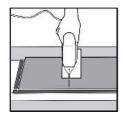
Cut to length— remember sawing tips, if cutting using a drop-saw or hand saw, cut it with the visible face up. Then install it as per previous plank. If using a jig saw its face down to avoid chipping.
